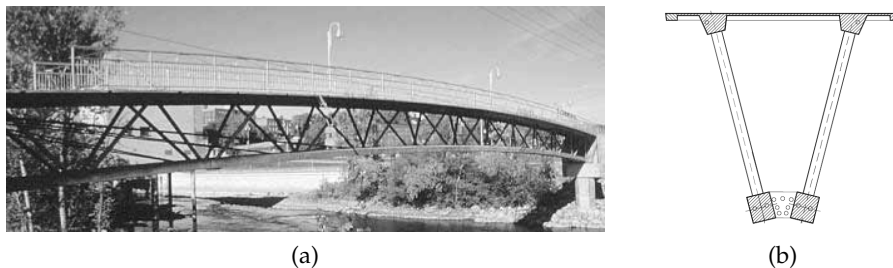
Sherbrooke pedestrian bridge [2], UHPFRC used for filling of space-truss tube elements
